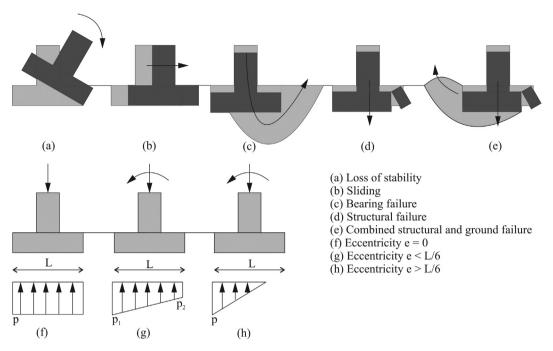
Geotechnical and structural failure possibilities (a-e), and loading actions on pad footing (f-h).
